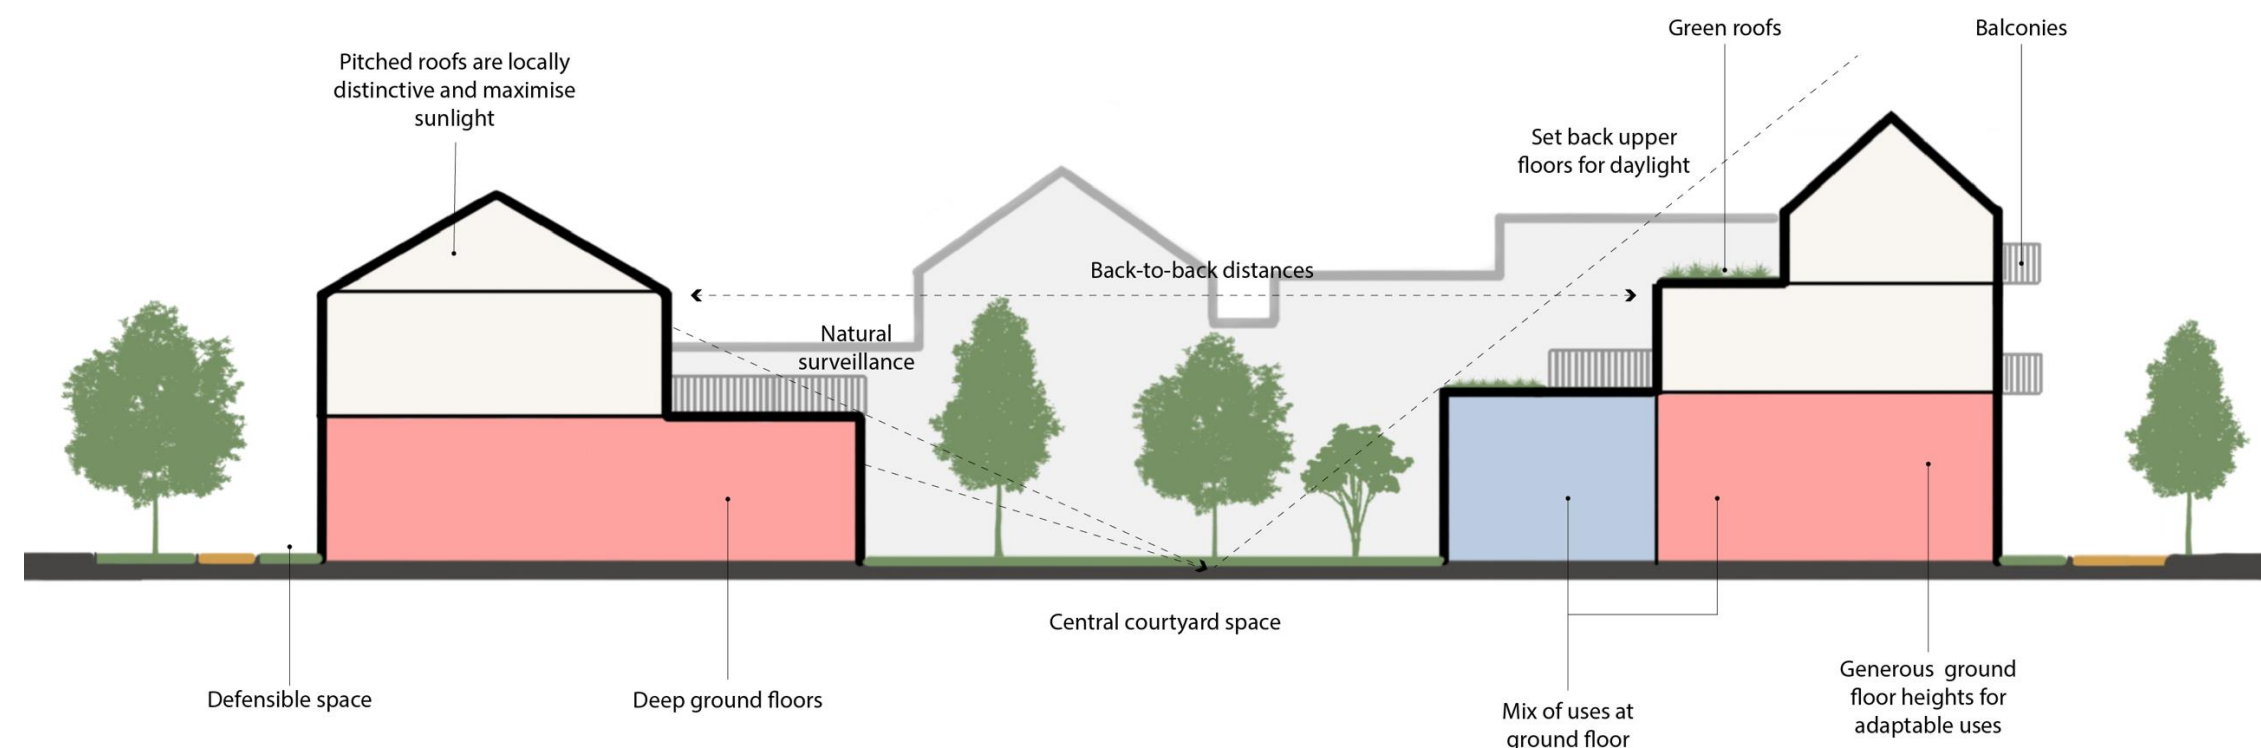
Cross section through a perimeter block indicating mixed use development with active uses at the ground floor and generous floor to ceiling heights that allow for change and flexibility over time. Deep floorplates at ground floor can accommodate uses such as foodstores whilst respecting the urban grain
